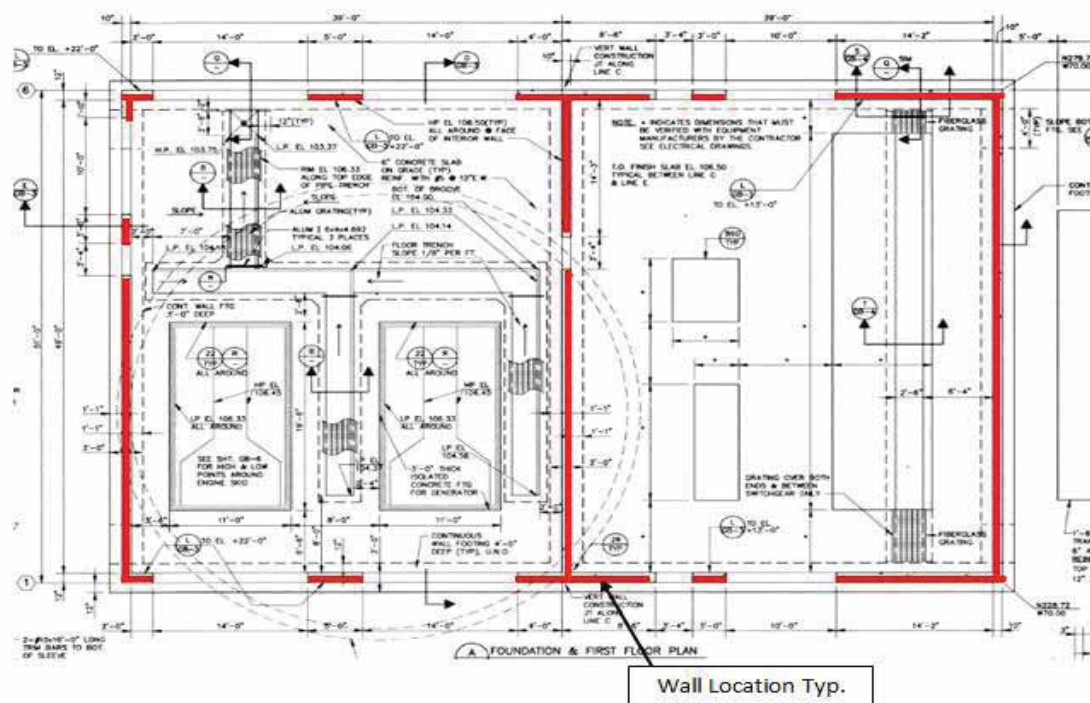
Main Electrical Distribution Building Concrete Wall Locations
